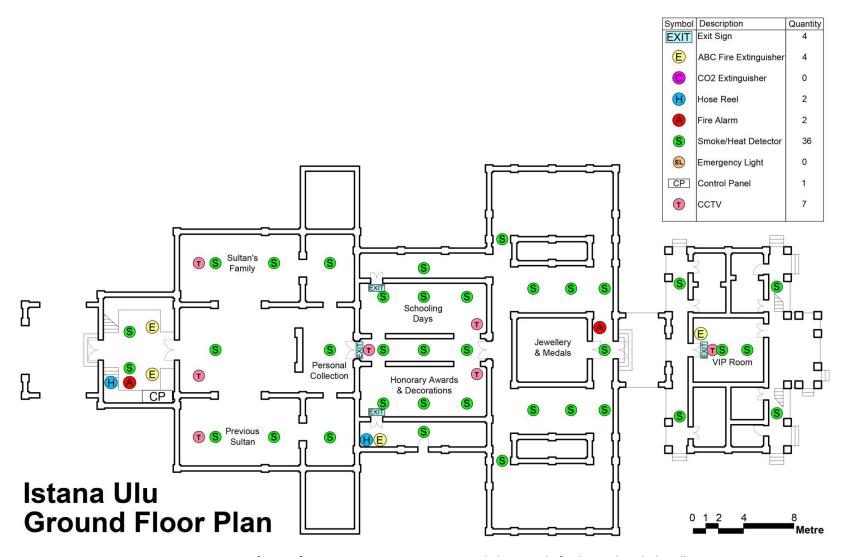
Location of active fire protection measures at Ground Floor Level of Sultan Azlan Shah Gallery
